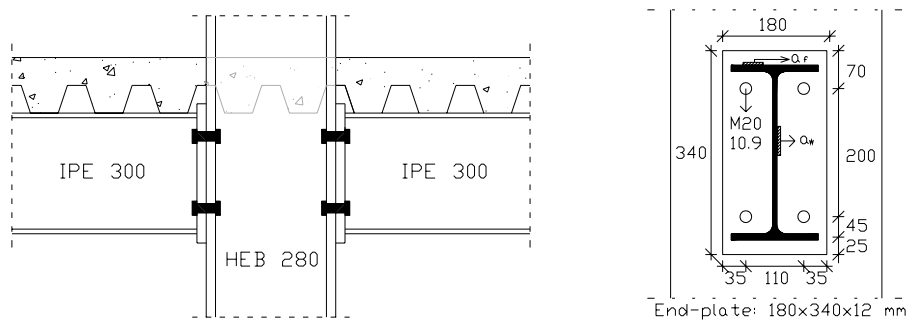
Double-sided composite joint and joint details of the Bochum frame
